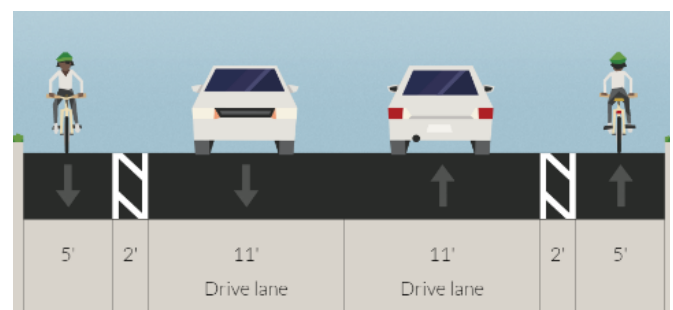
West 19th St.: Proposed Improvements. (from Riverside to West Street)
